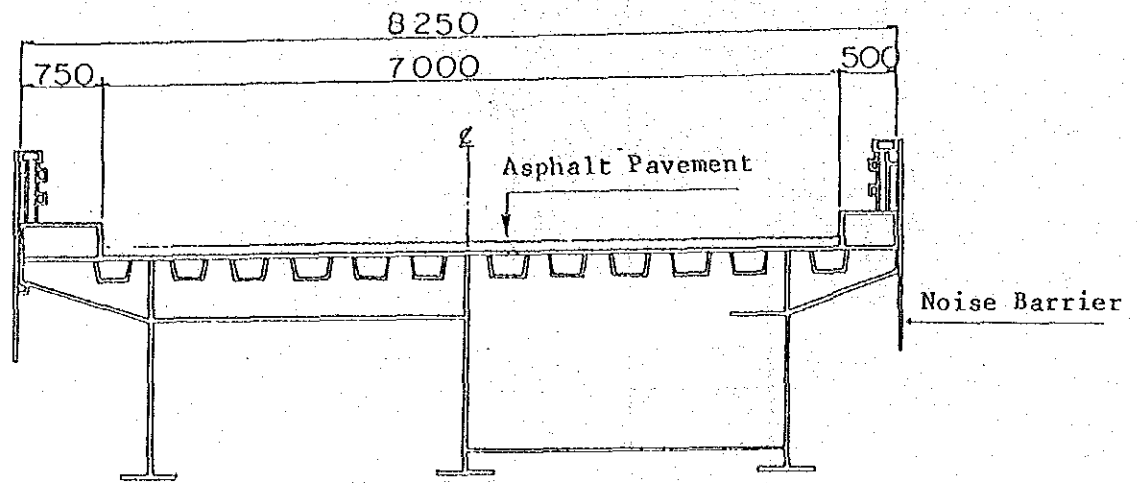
Standard Cross Section: Steel Orthotropic Deck
